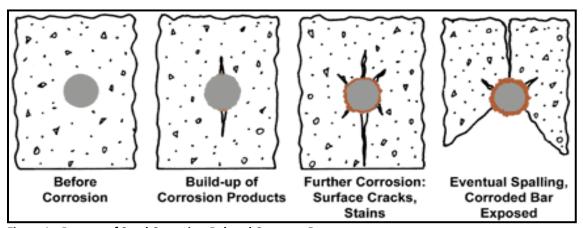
Figure J – Process of Steel Corrosion-Related Concrete Damage
